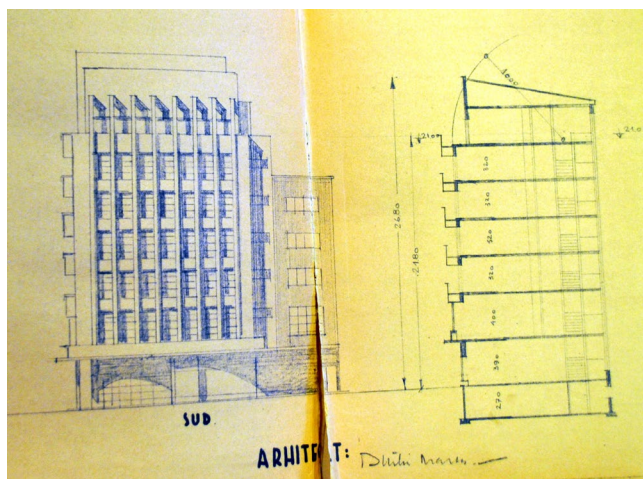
Magistrates house, architect Duiliu Marcu (1935). Perspective drawing, facade and plan from the Town Hall of Bucharest city archives (PMB fond tehnic)
